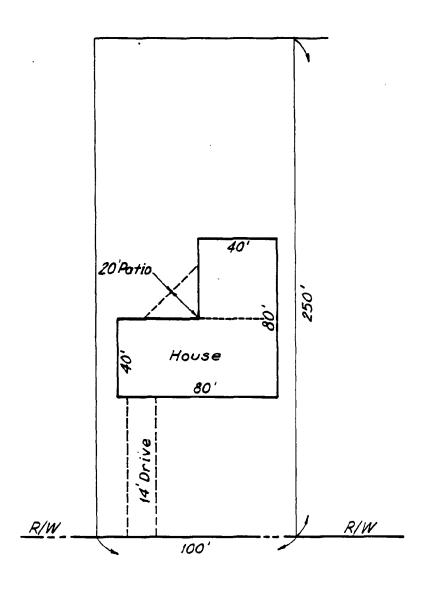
ON-SITE STORM WATER MANAGEMENT ALTERNATE NO. 1 SURFACE STORAGE
